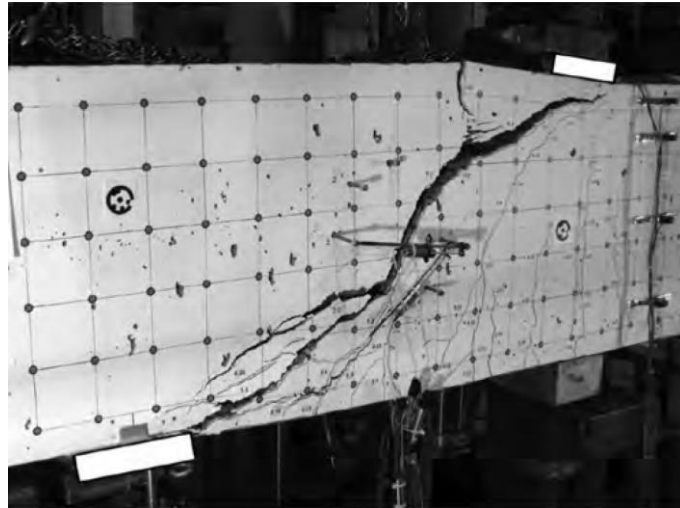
Example of Diagonal Tension Failure in a reinforced concrete beam [13]
